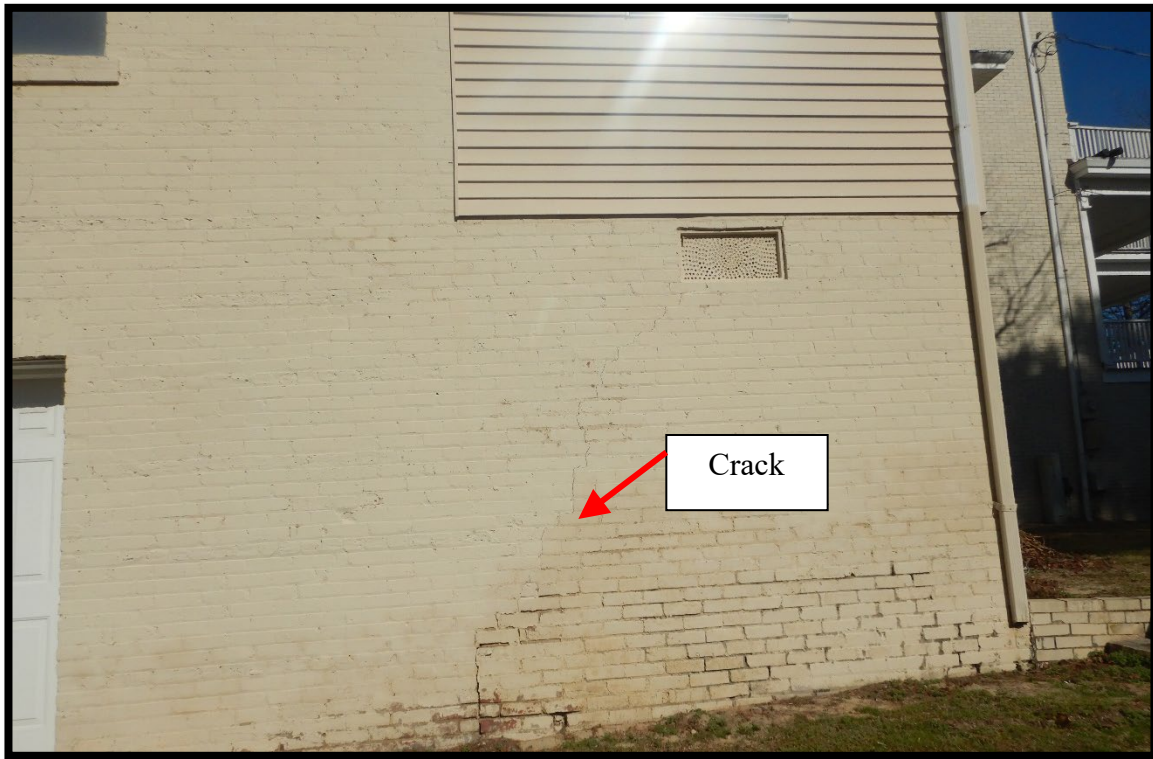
Minor brick cracks at the rear elevation.
